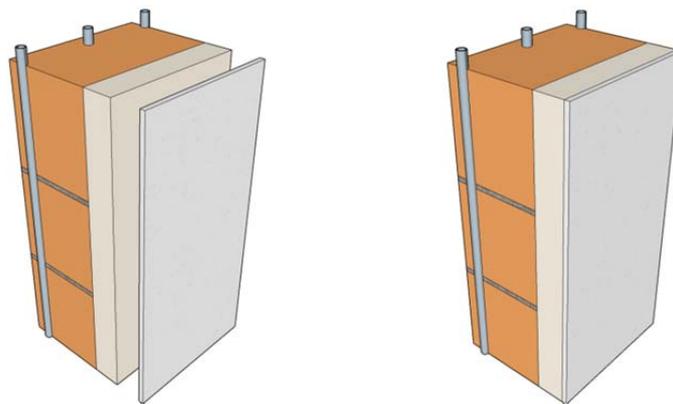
Schemes of the radiant wall with ventilated facade (left) and without (right)
